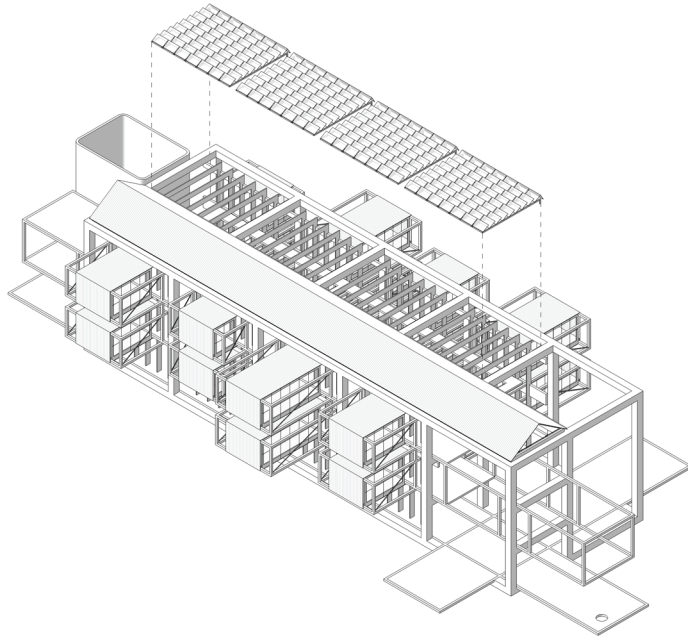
Exploded and assembled views of the buildings louvered roof installation
